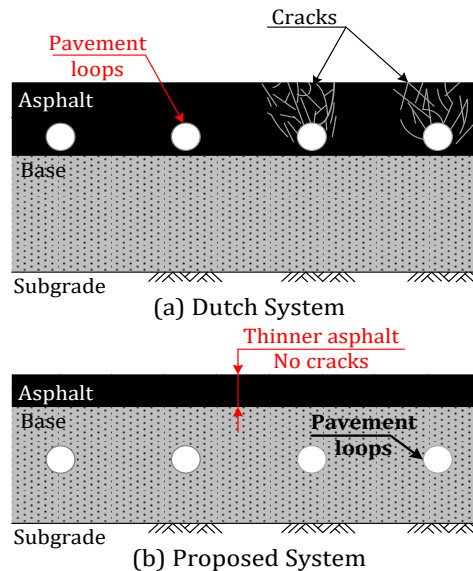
Sketches of (a) the Dutch heated pavement, and (b) the proposed technology.
